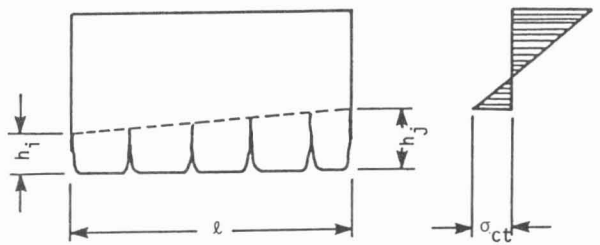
Analytical Model of the Cracked Concrete Beam Element.
